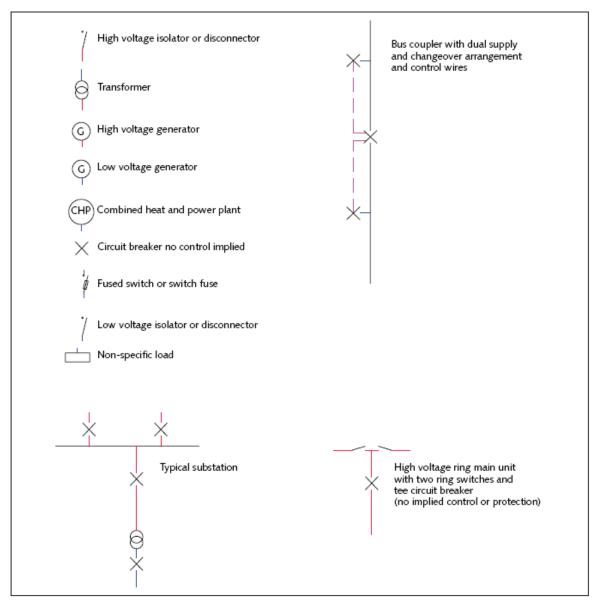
Drawing symbols used in this Scottish Health Technical Memorandum
